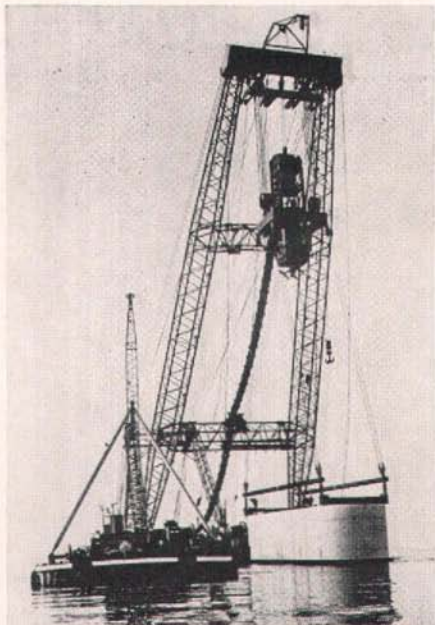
Lifting a precast caisson onto the cylinder piles to form a pier
